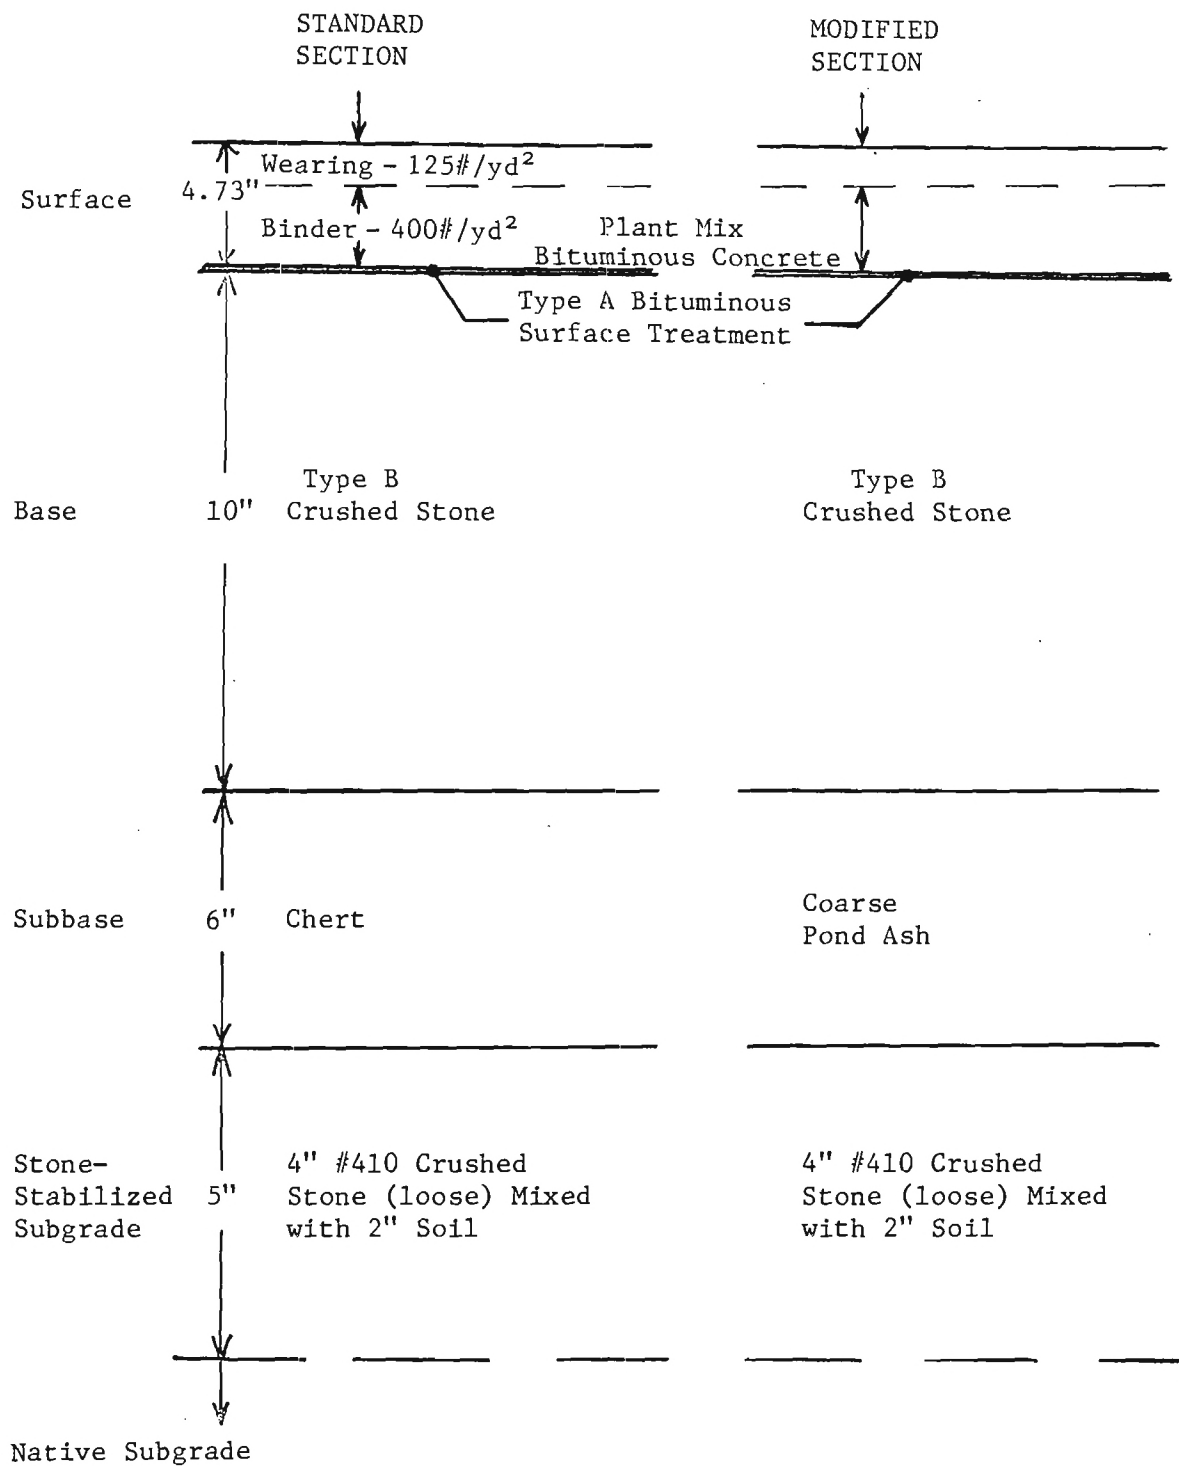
Standard and Modified Pavement Sections - Dunn Construction Company
